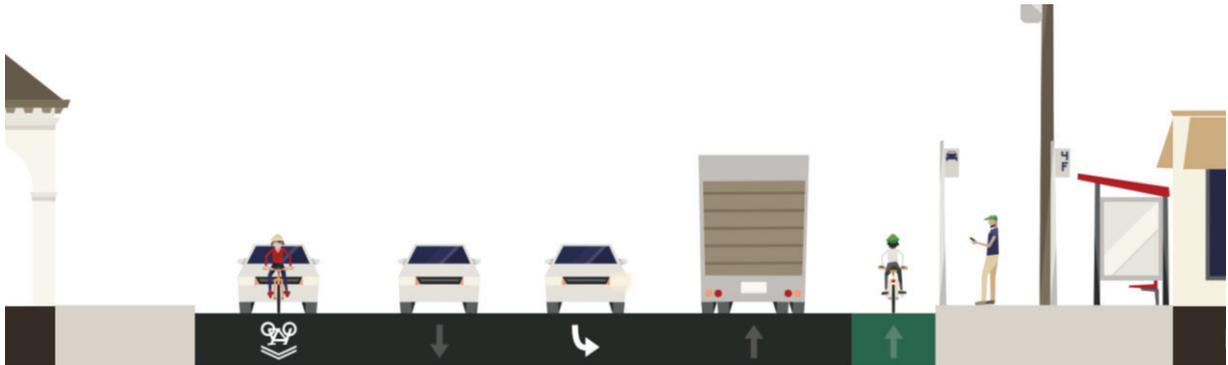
Proposed Cross Section of Evans Avenue between Phelps and 3rd Streets, looking west
